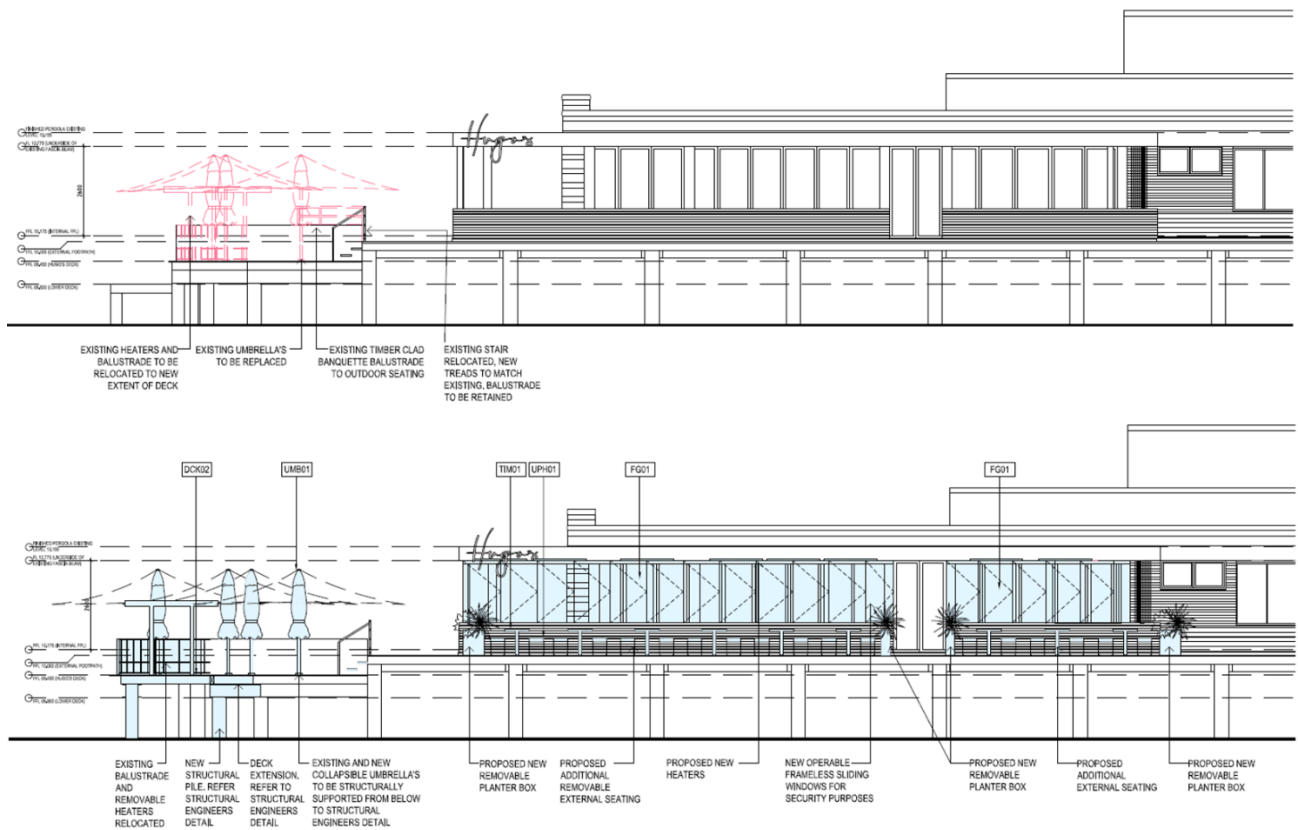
Southern elevation (existing above compared to proposed elevation below)
